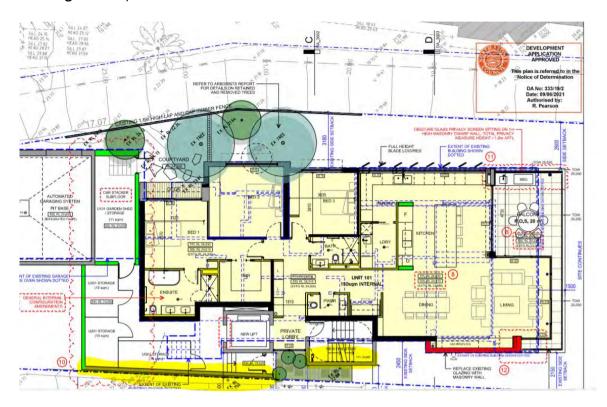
10m & 3.8m wall highligted yellow on stamped plans for s.4.55 DA 333/19/2 issued 9.6/2021.
